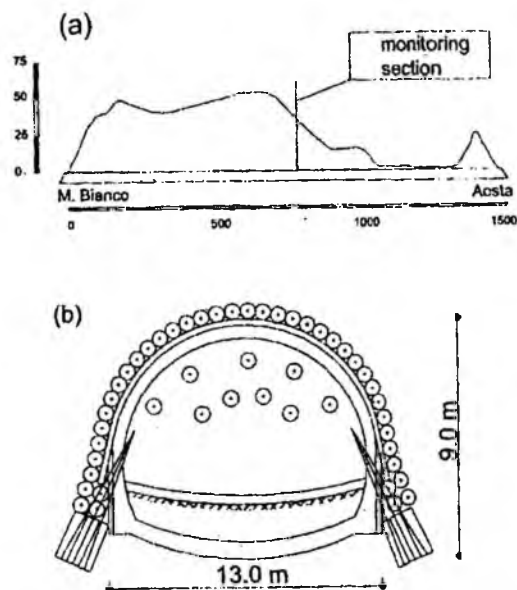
Longitudinal profile (a) and cross section (b) of Les Cretes tunnel.
